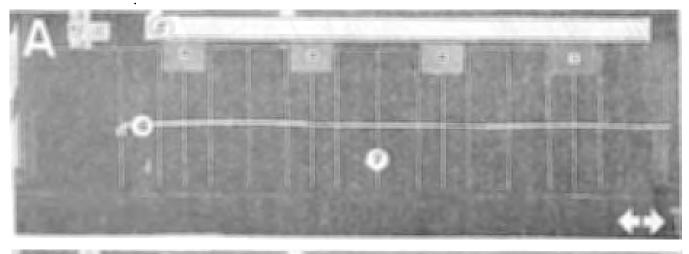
Modelling of the interrelation of the transversal foundation benches under the conditions of horizontal slackening of subgrade without reinforcement A) Initial state
